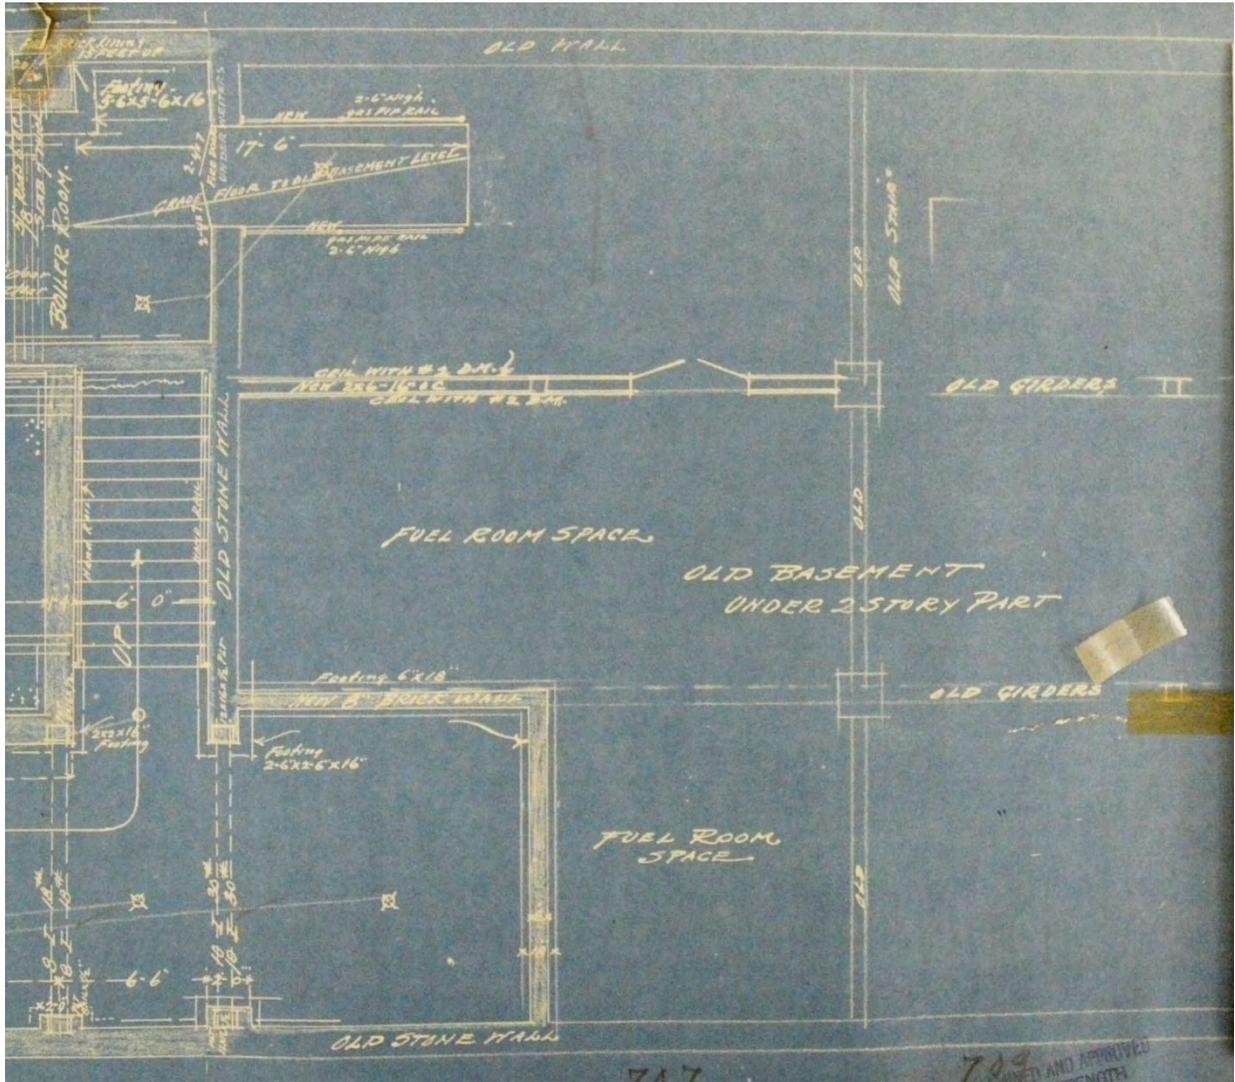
Basement in the 1910 building, from Haley's drawing set, source: Northwest Architectural Archives
